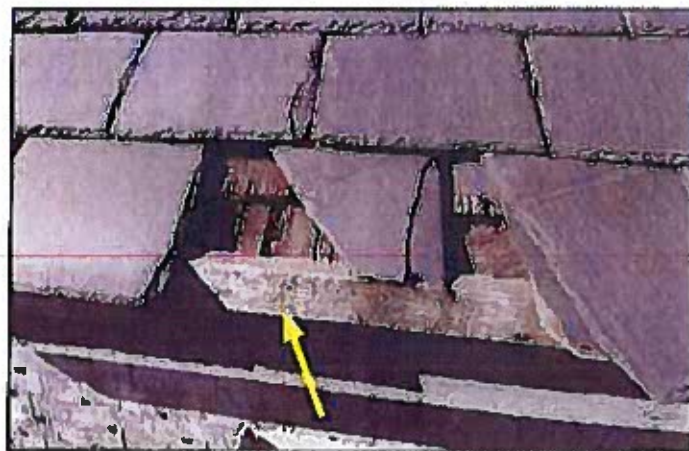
Roof return at dormer showing original wood shingles under slate and 2" high wood fillet (arrow) added to top of crown molding to support bottom of first slate course.
